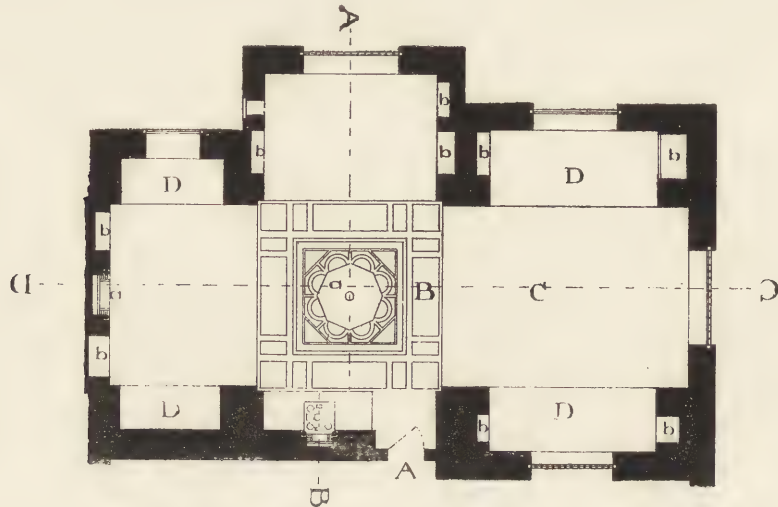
MANDARAH IN THE HOUSE OF THE MUFTI: PLAN.
